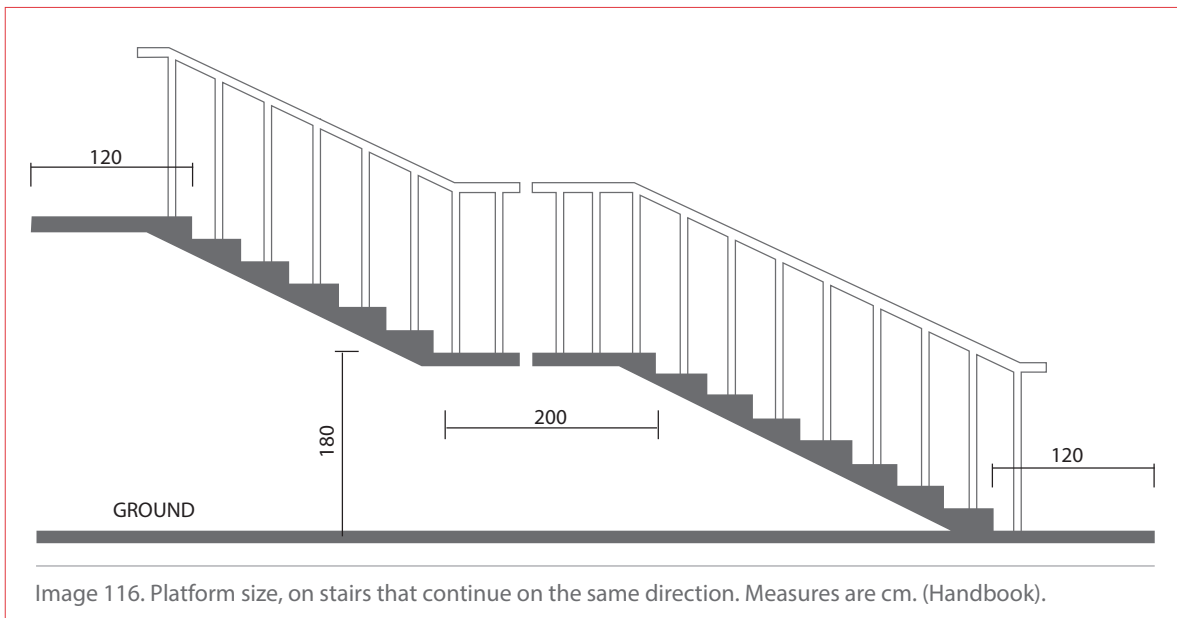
Platform size, on stairs that continue on the same direction. Measures are cm. (Handbook).
